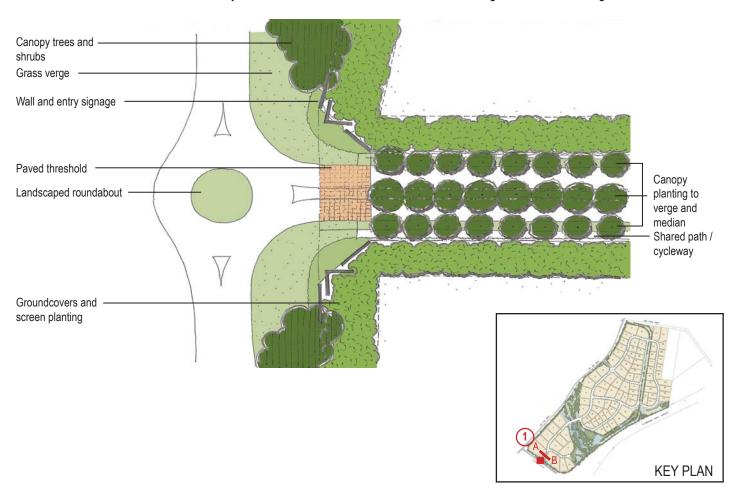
CONCEPT PLAN: Proposed entry treatment at intersection of Sparks Road and entry to Precinct 14
